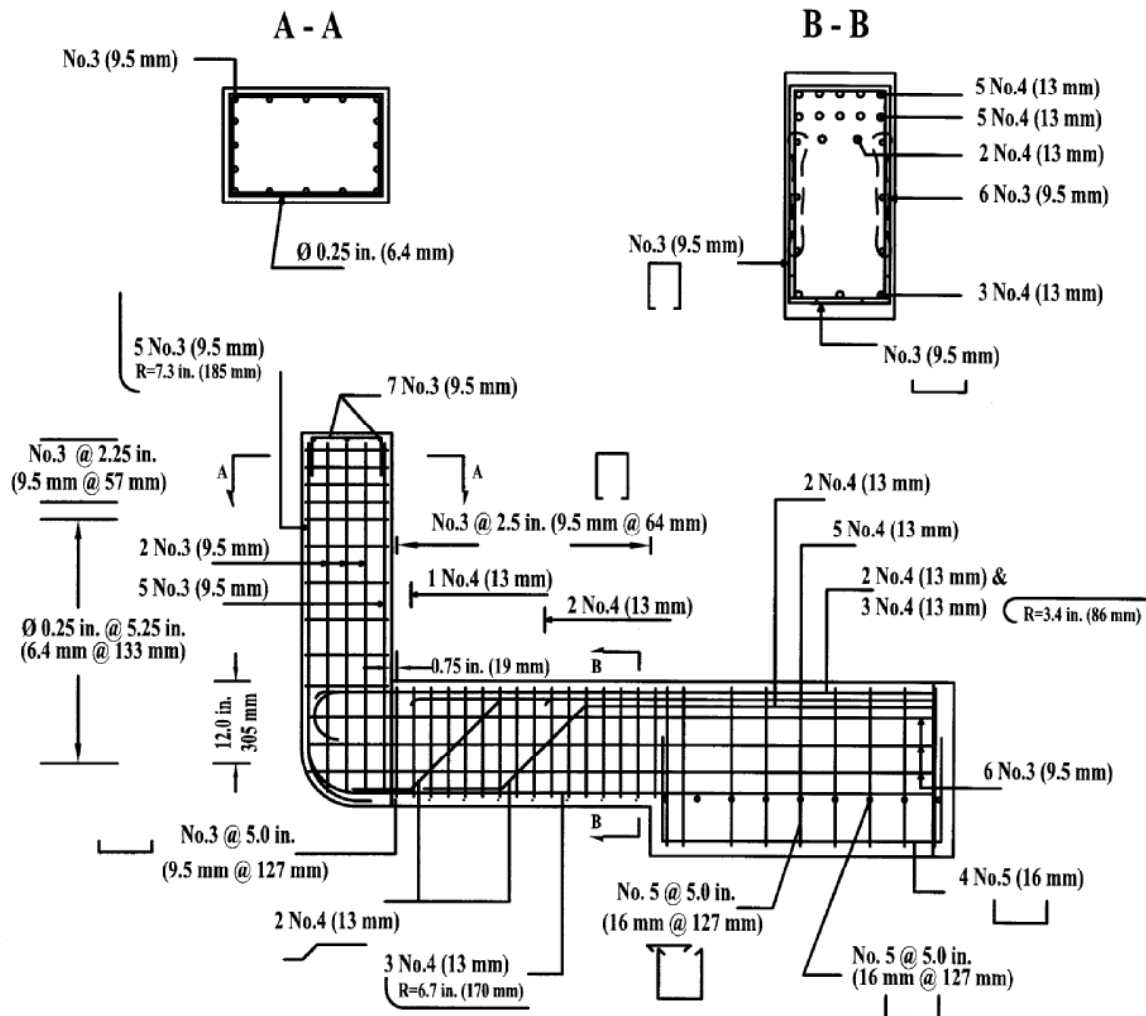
Retrofitted Split Outrigger Specimen Reinforcement Details
